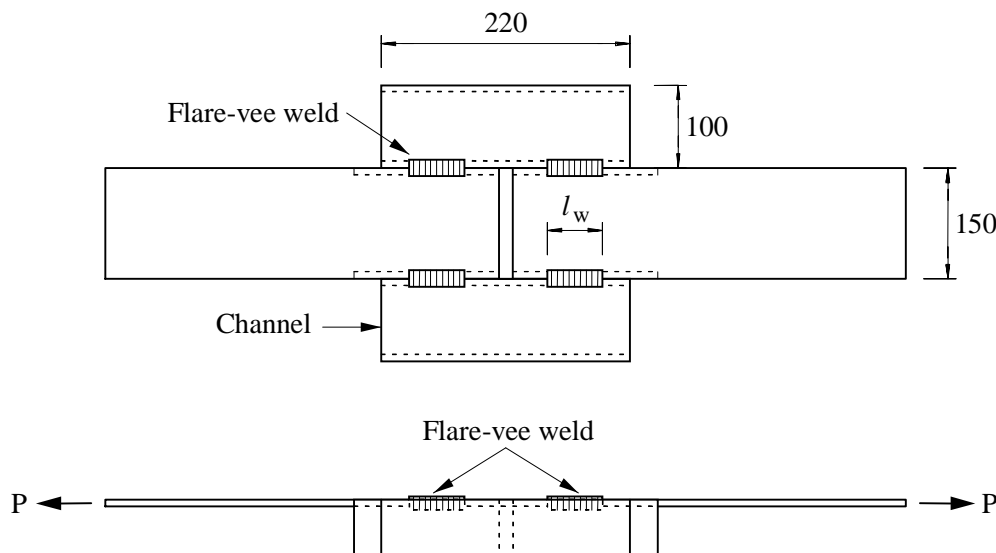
Longitudinal flare-vee welded connection in 3.0-mm sheet steel
